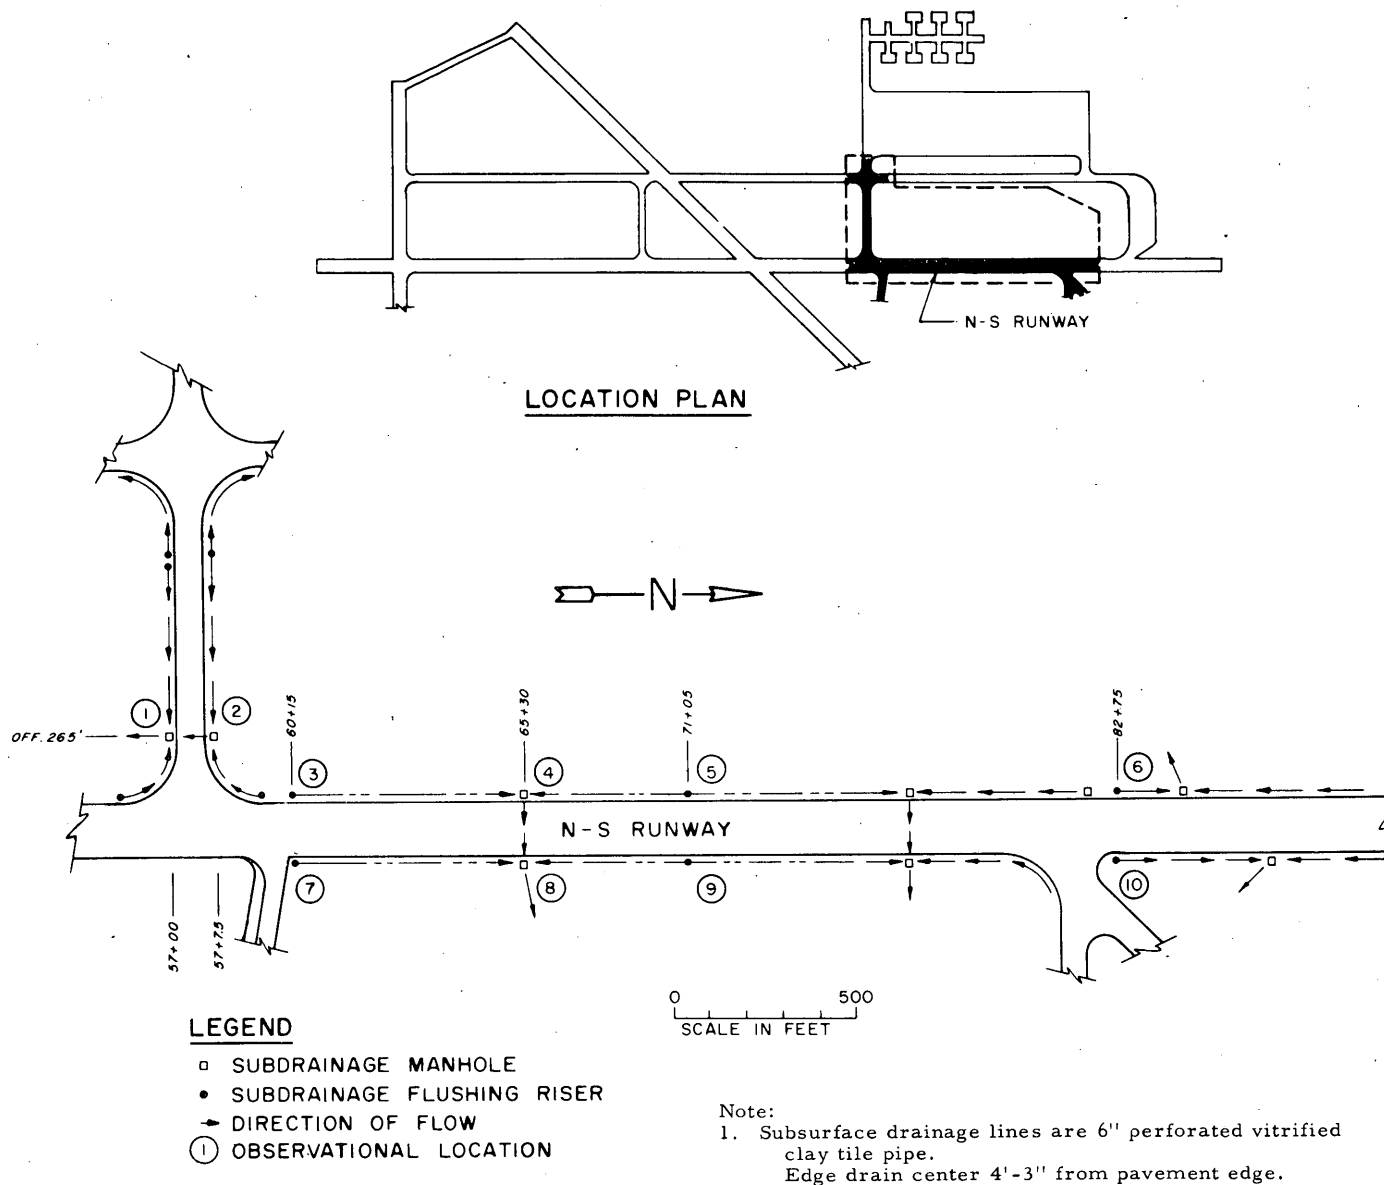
Subsurface drainage observational locations, Selfridge AFB.
